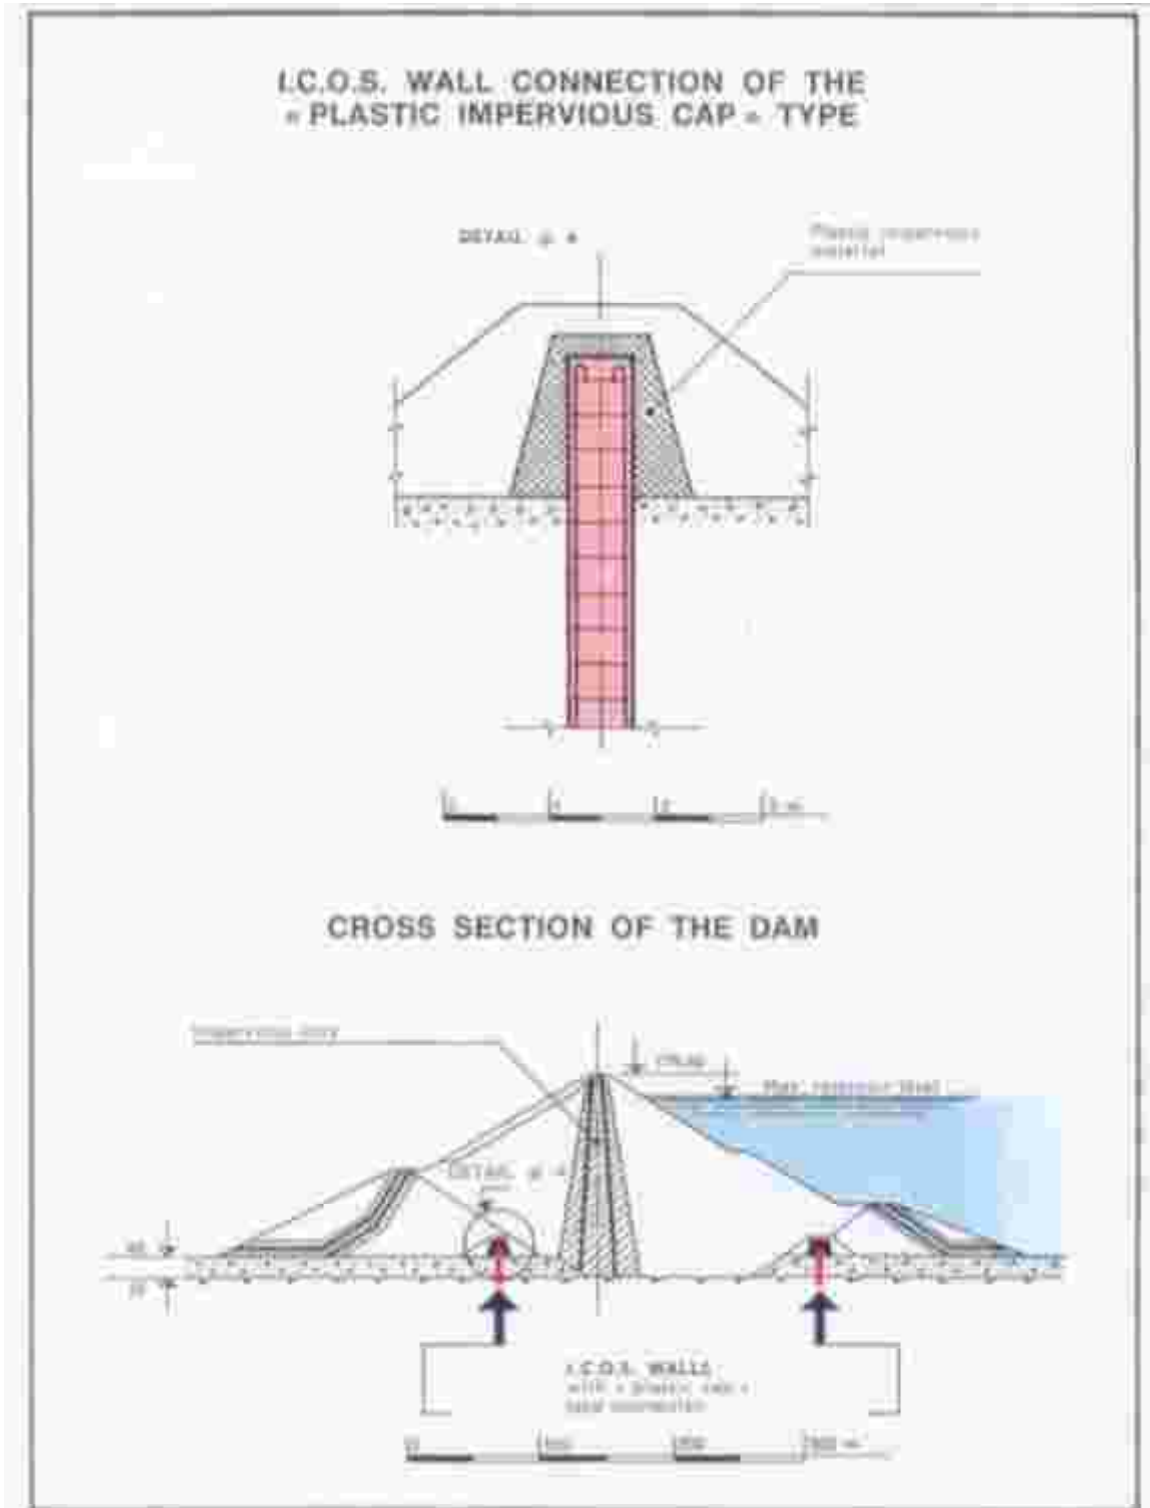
El Infernillo Dam, Mexico: Connection of pile cutoff wall to pre-cofferdams to enable excavation of alluvium to place core of main dam on rock
